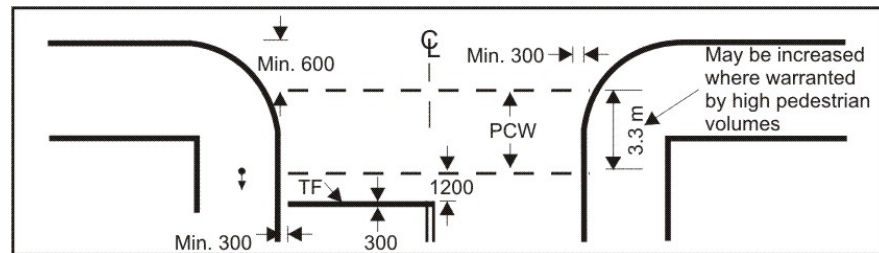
Typical pedestrian crosswalk lines at an intersection with a marked foot crossing
